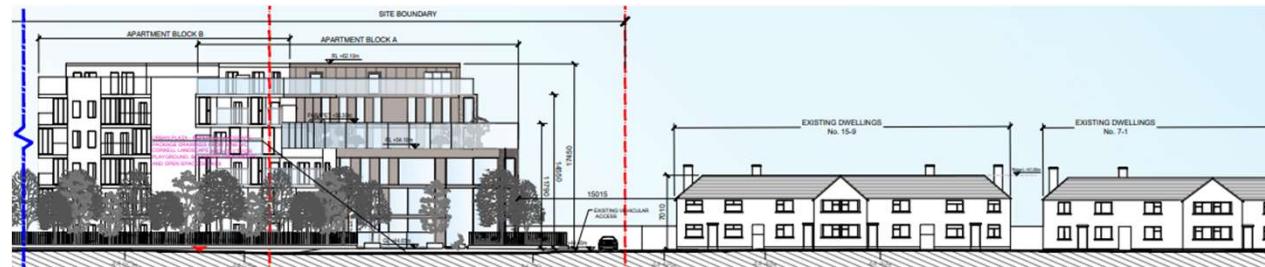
Contiguous Elevation – View Along Kennelsfort Road Lower – Extracted from Existing Scheme
